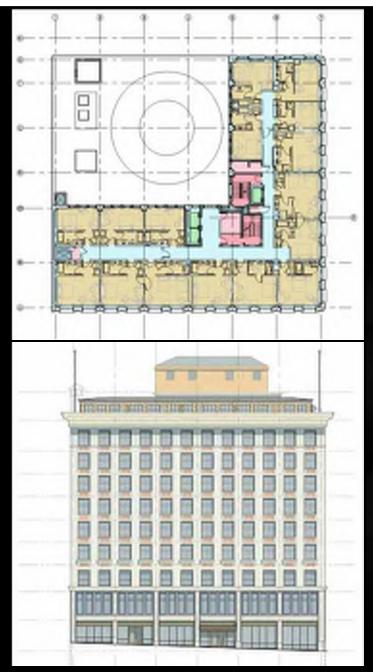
& 42: Typical upper floor plan and elevation for the hotel configuration of the Arctic Building. Credit: Weaver Architects, 2005.
